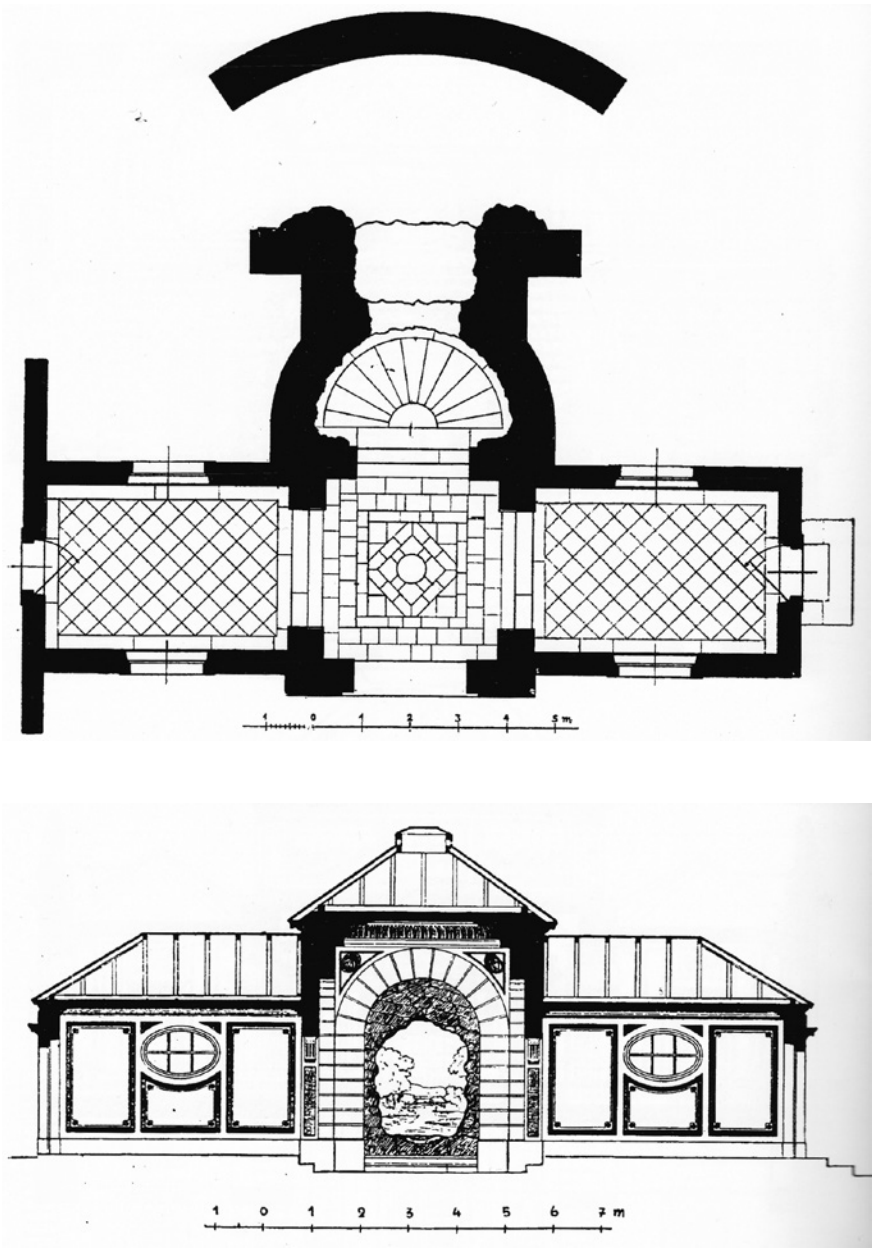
Floorplan and elevation of the Perspective Pavilion, Schwetzingen.
